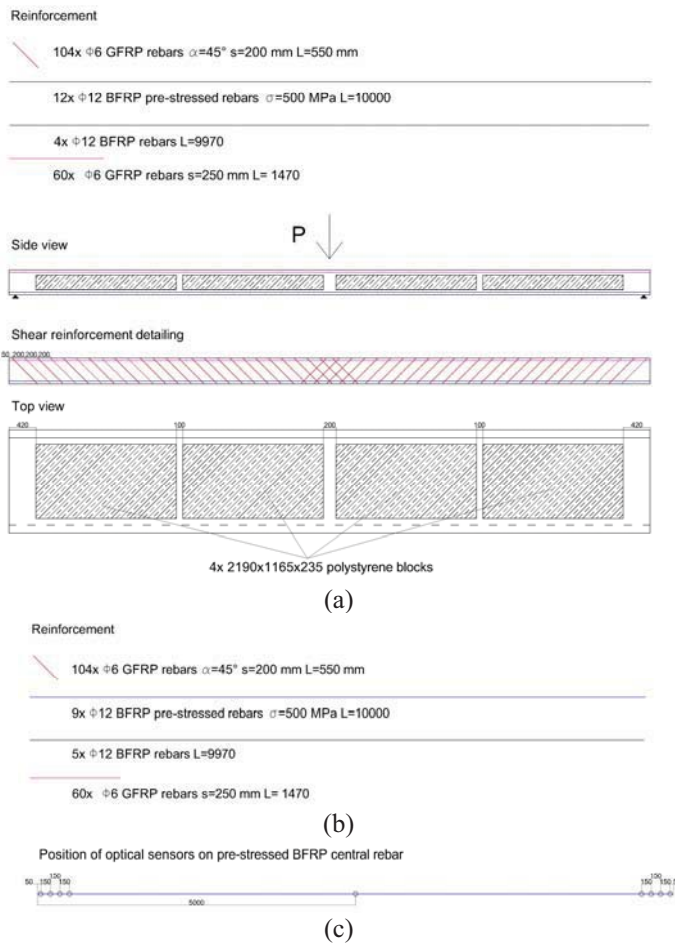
Slab beam views and reinforcement details: (a) designed, (b) reinforcement realised, (c) position of optical sensors on one central BFRP bar.
